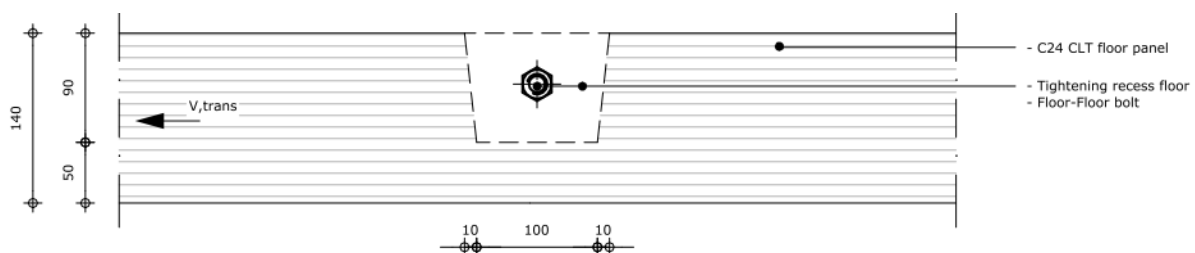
Cross-section B-B of Figure 10-7 floor-to-floor connection with shear force transverse diaphragm in mm
